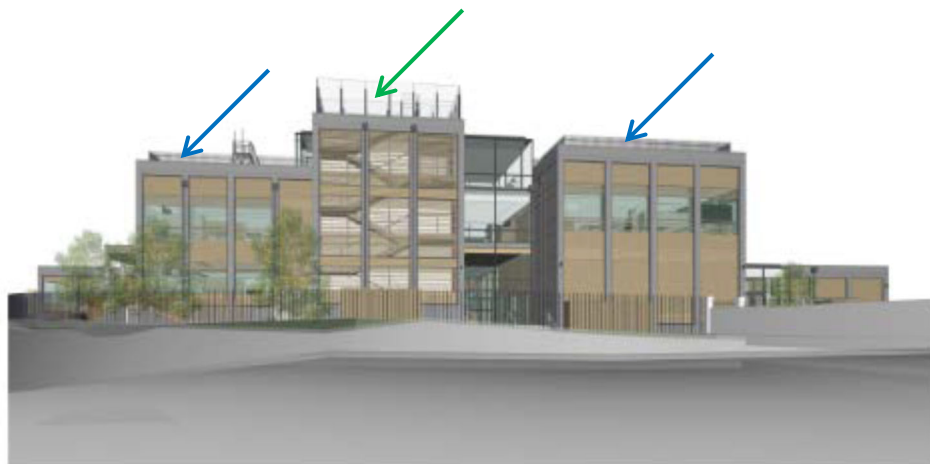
The Assessment Report, with the Safety Protection Structures to Building J & H which comprise palisade balustrade and parapet to the east (Building H) and west (Building J) portions (blue arrow) and a central (Building J) glazed balustrade (green arrow) Figure 36 | Proposed view from the south (Source: SRtS 2021), Modification I (SSD-I0340-MOD-1) | Modification Assessment Report, p44).
